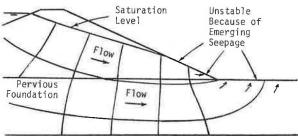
Cross section through a typical dam or levee having no drainage system.
